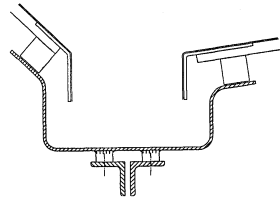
Platform roof Den Bosch Station. Modified support for the gutters on distance blocks.
